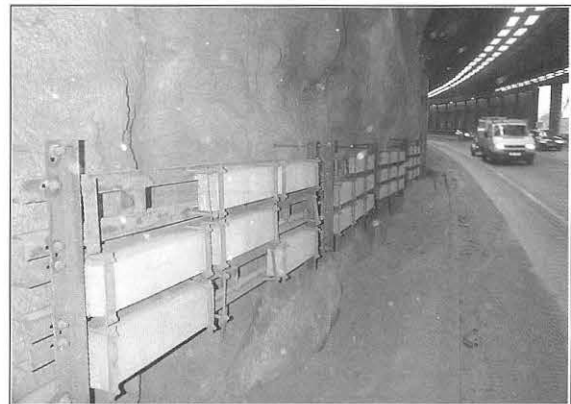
Field exposure of shotcreted test specimens in the Eugenia road tunnel in Stockholm, photo Erik Nordström
